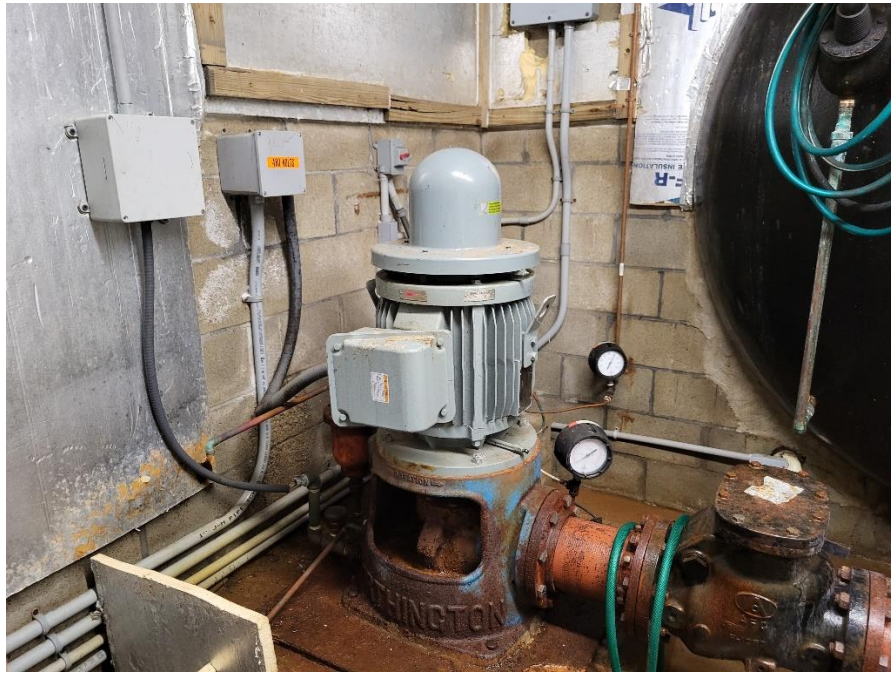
Existing pump for Well GPW 1. Taken 6/27/23
